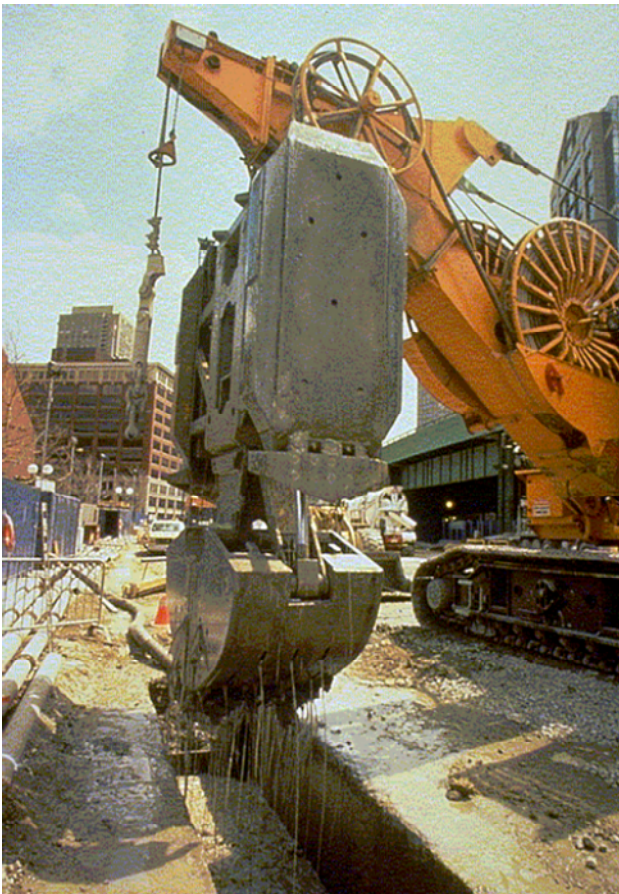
Slurry wall construction at Central Artery Project in Boston, MA
